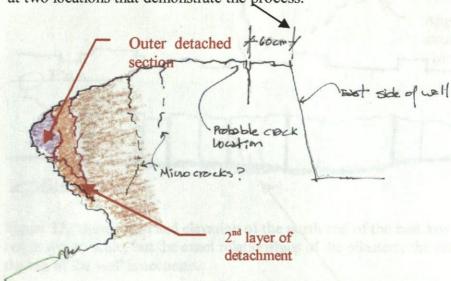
Sketch Section showing the typical detachment sequence on the west side of the east wall looking south.
